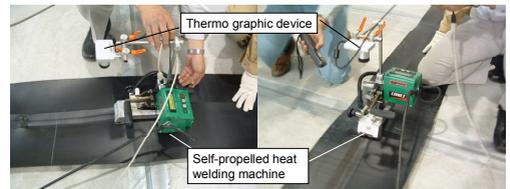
A self-propelled heat welding machine with a thermo graphic device
